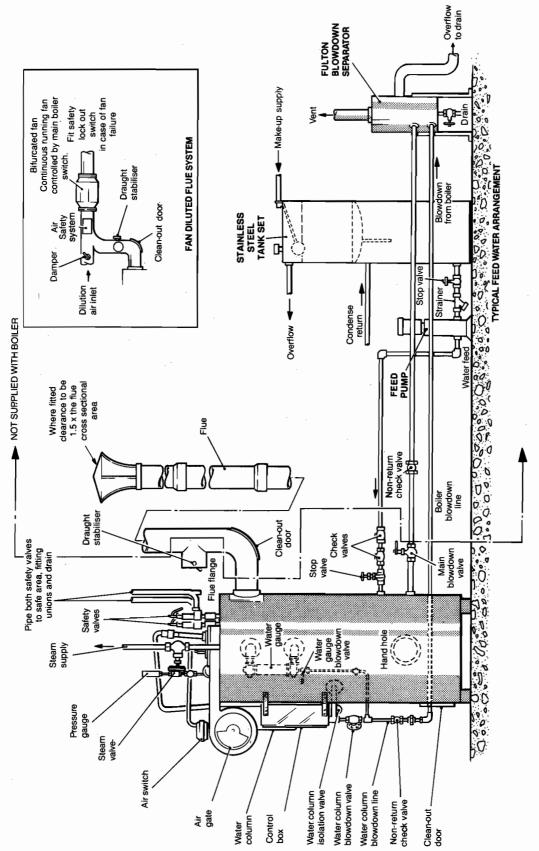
TYPICAL INSTALLATION ARRANGEMENT
